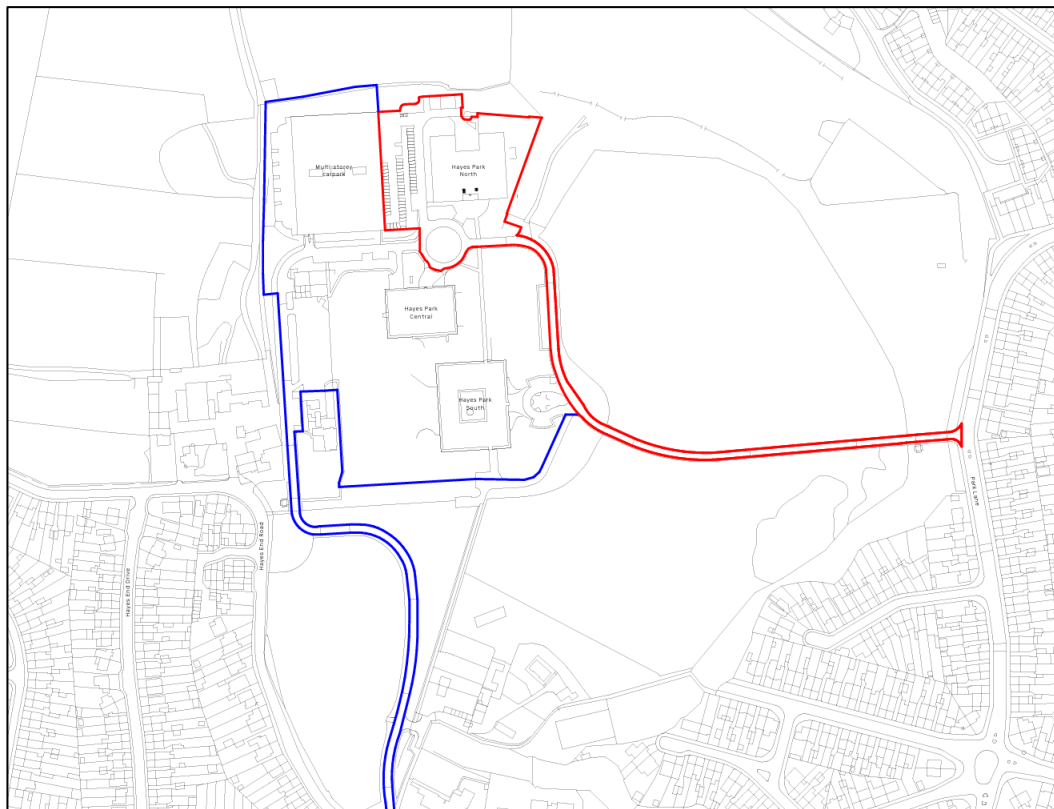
Approved Site Location (source: Studio Egret West submission dwg 0447-SEW-ZZ-ZZ-DR-A-PL0000/T3)
